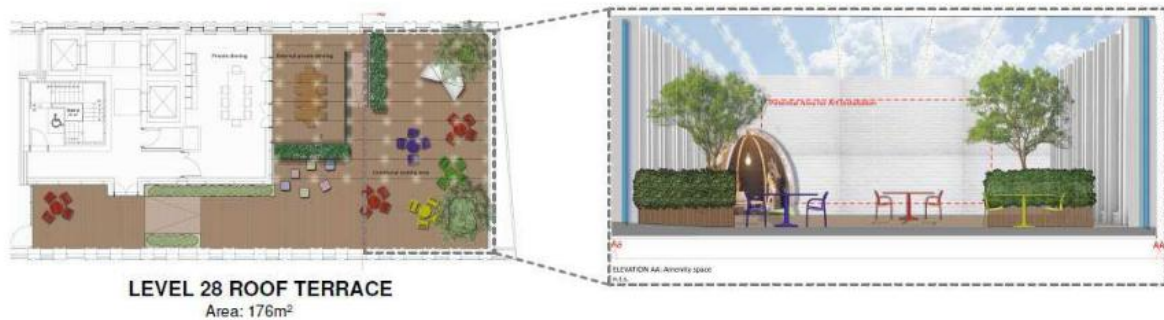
Illustration of outdoor amenity at level 28/roof terrace
